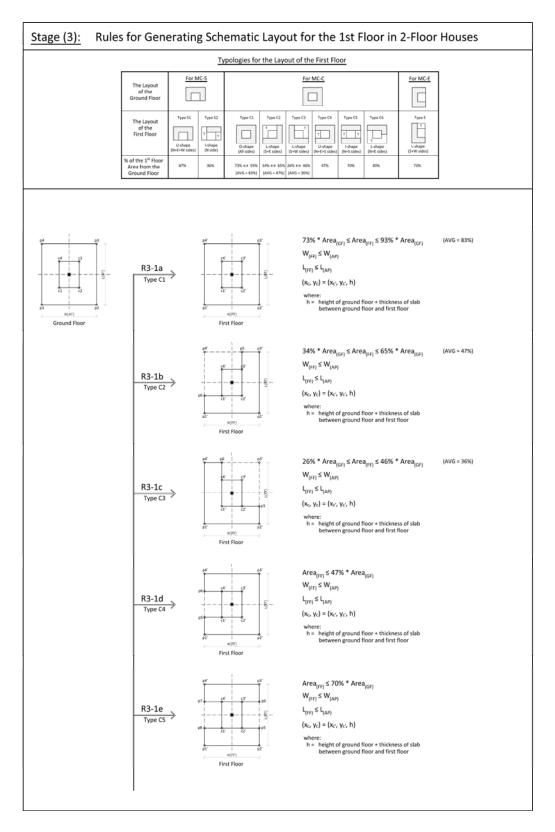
Sets of parametric rules for generating the schematic layout of the ground/first floors in two-floor houses (part 1)
